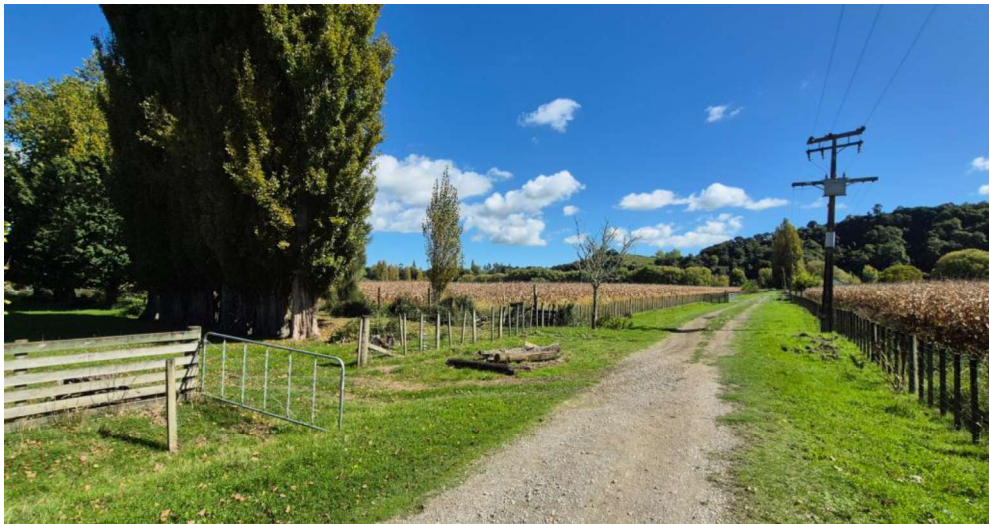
Photo of the existing power lines on Morris Road that feed #44.
